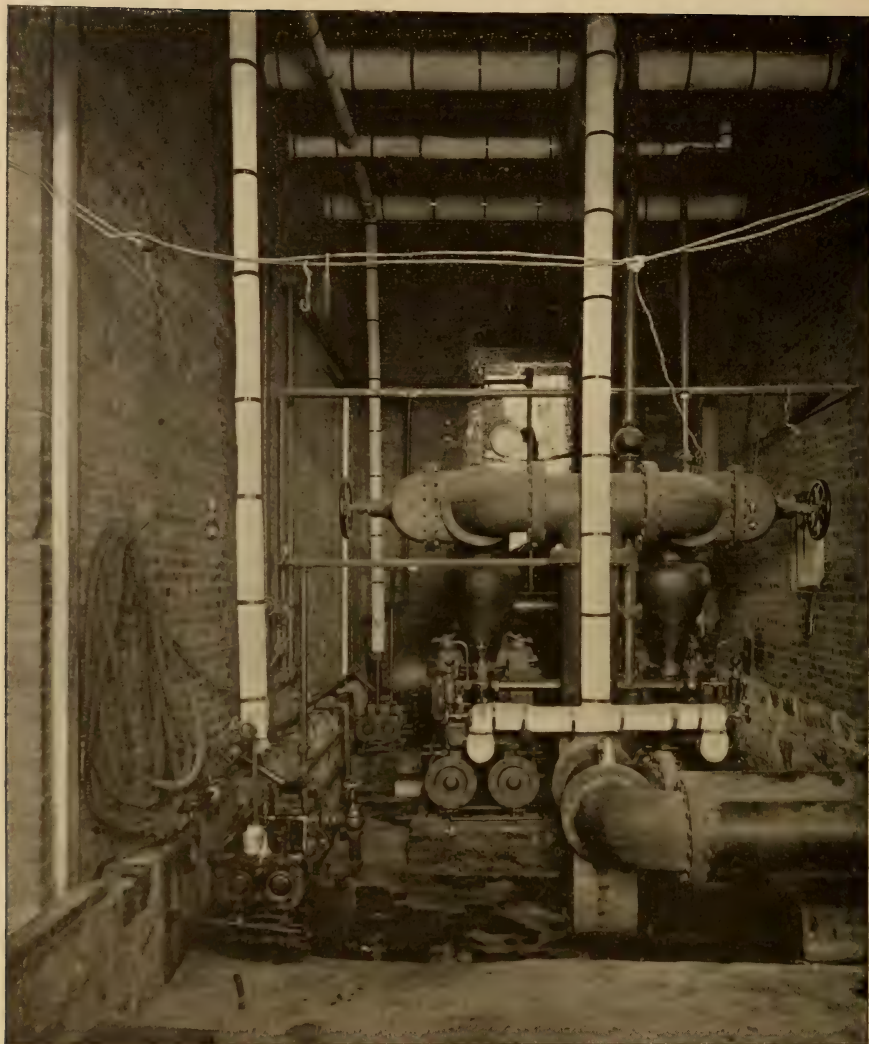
ELEVATION OF THE SYSTEM OF PIPING AT CORTLAND.
